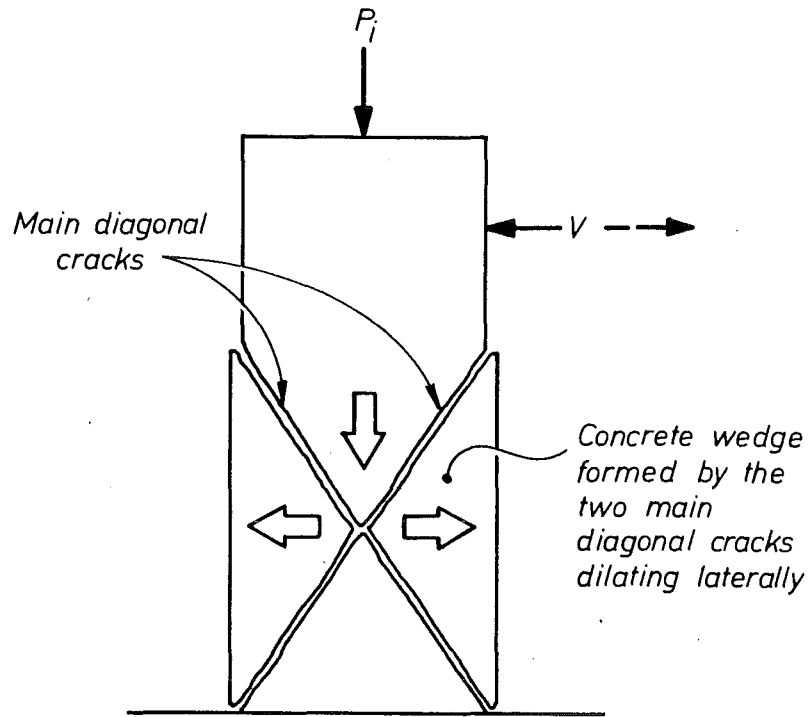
Wedging action of concrete blocks formed by the main diagonal cracks
